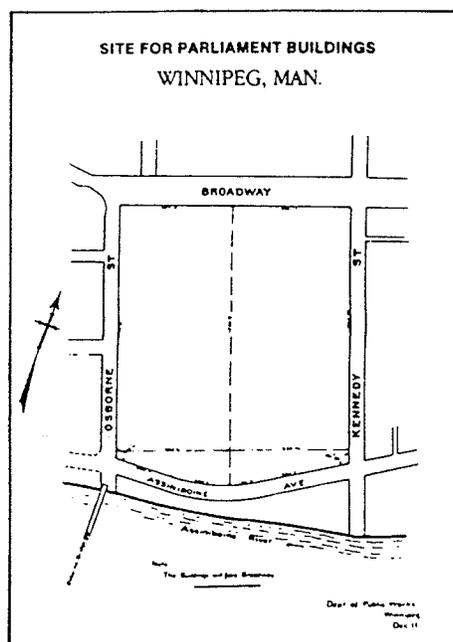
Site Plan for the Legislative Building Competition, 1912.
